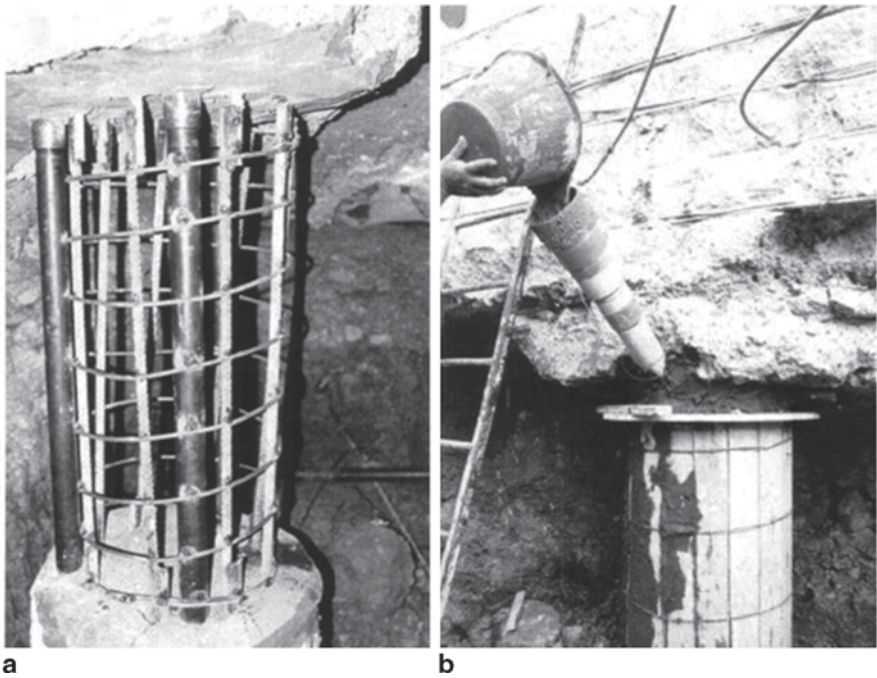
Pile restoration. a Steel bars. b Concrete placement
